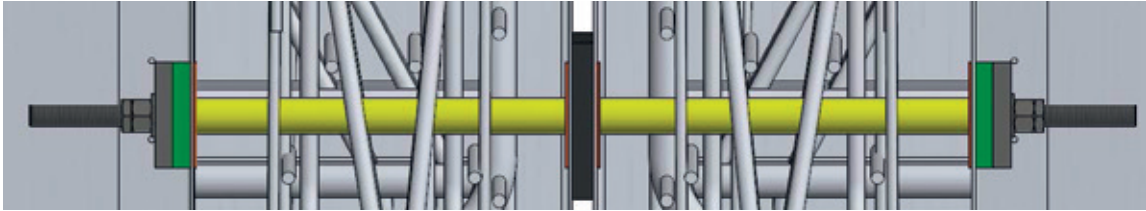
Through-bolt passes through two panels, and it is fastened to the tie-down bracket.
